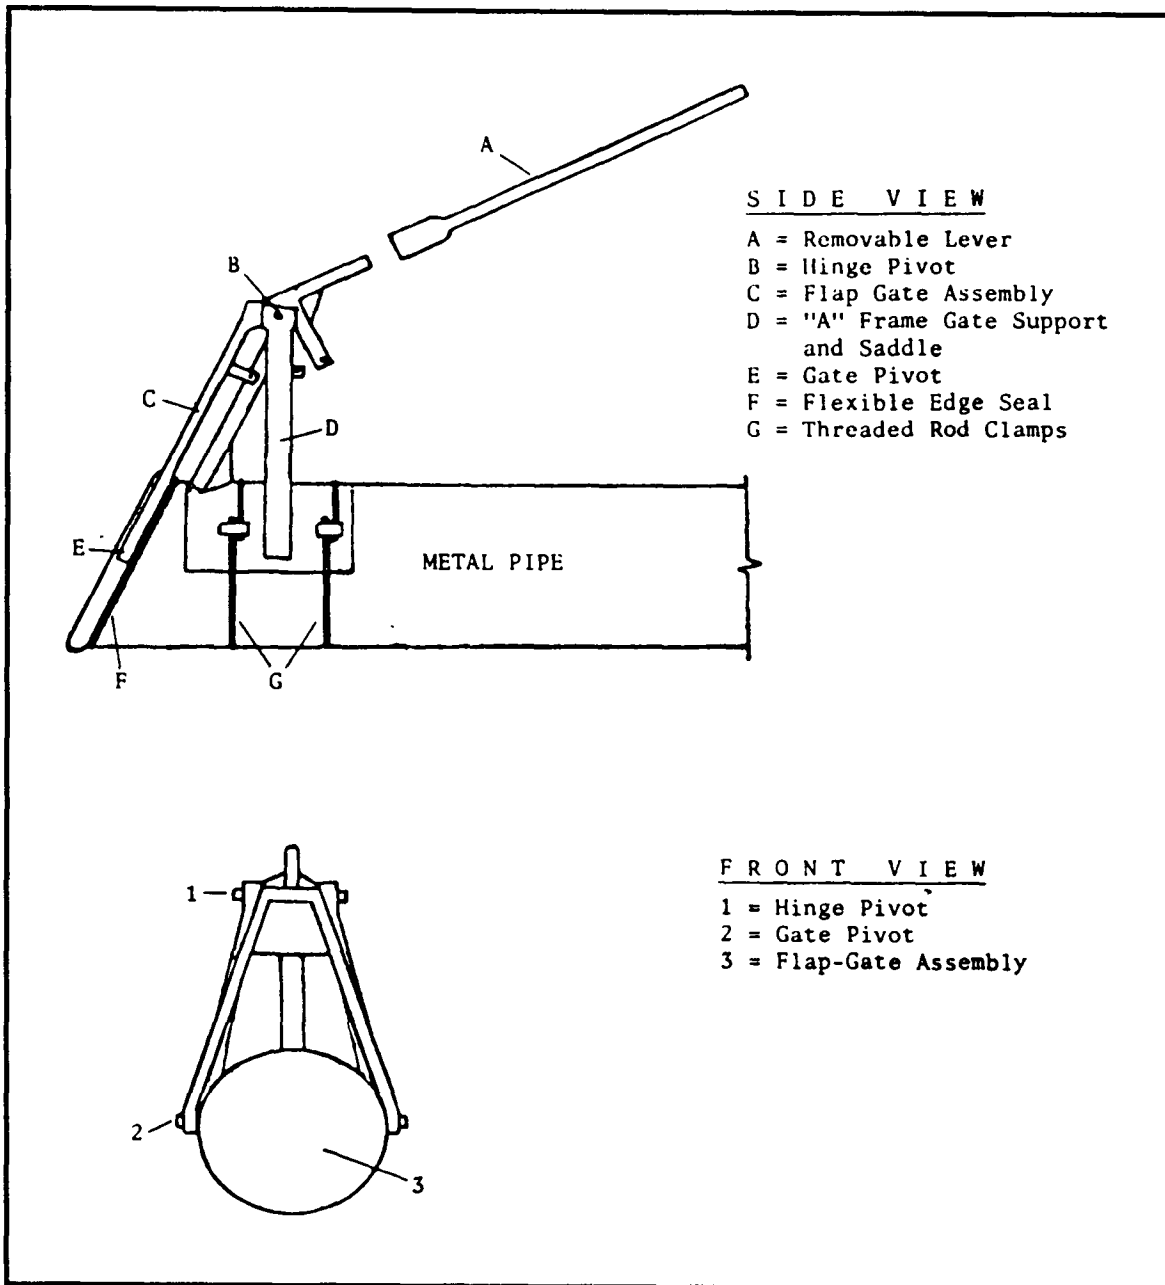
Single and double flap-gated culvert (Broussard 1988). NOTE: conceptual drawing; not to be used for design.
